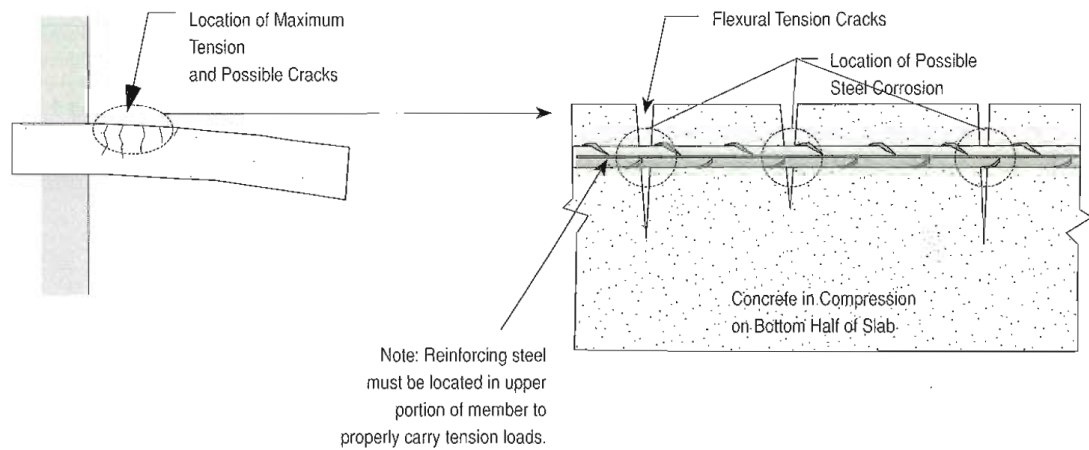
Illustration of Cracks in Cantilevered Slab (Emmons, 1993)
